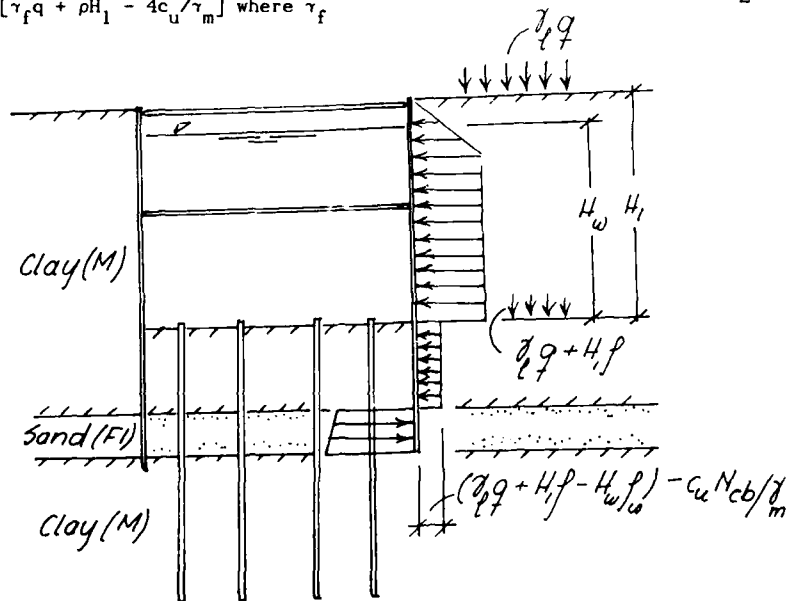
Proposed design method for a strutted sheet pile wall in soft clay
